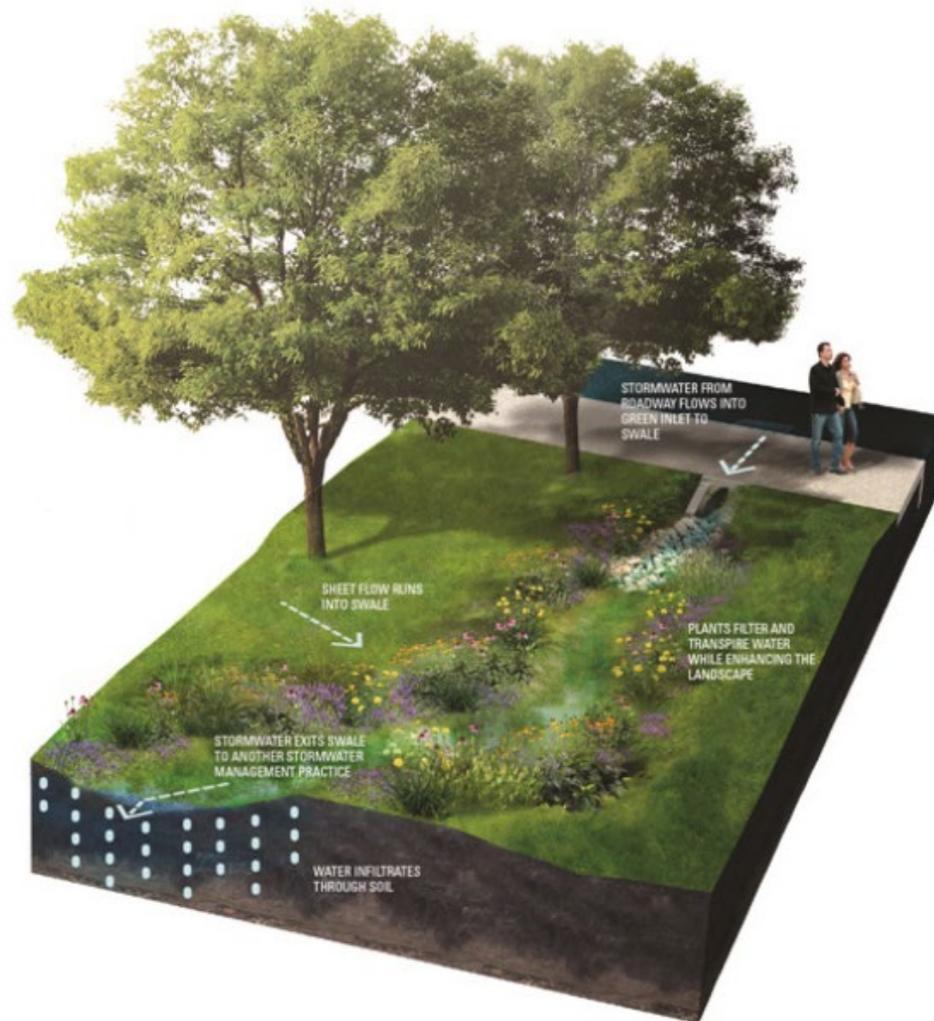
Example of typical layout for a bioswale. Source: Philadelphia Water Department.
